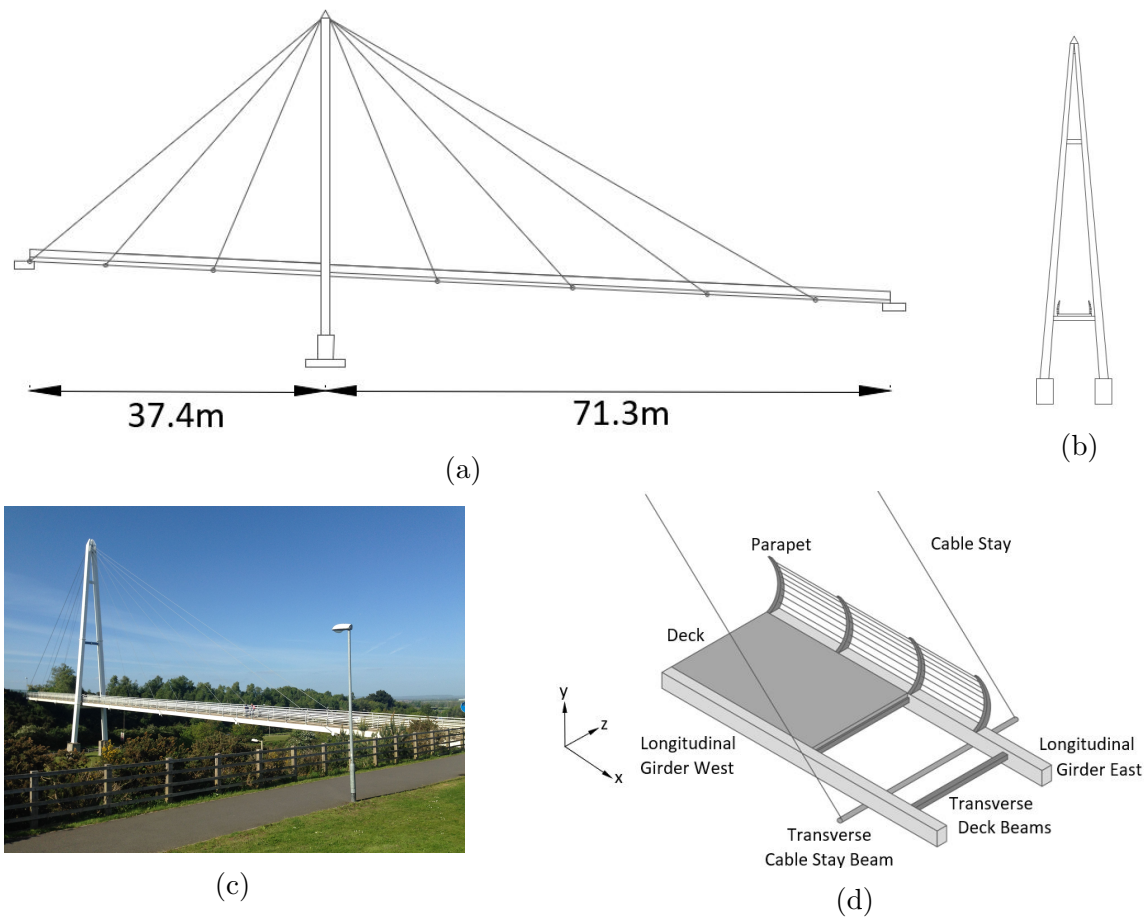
Cable-stayed footbridge: (a) elevation of the bridge, (b) end elevation (c) photo of the bridge and (d) part section of the deck with elements shaded and annotated.
